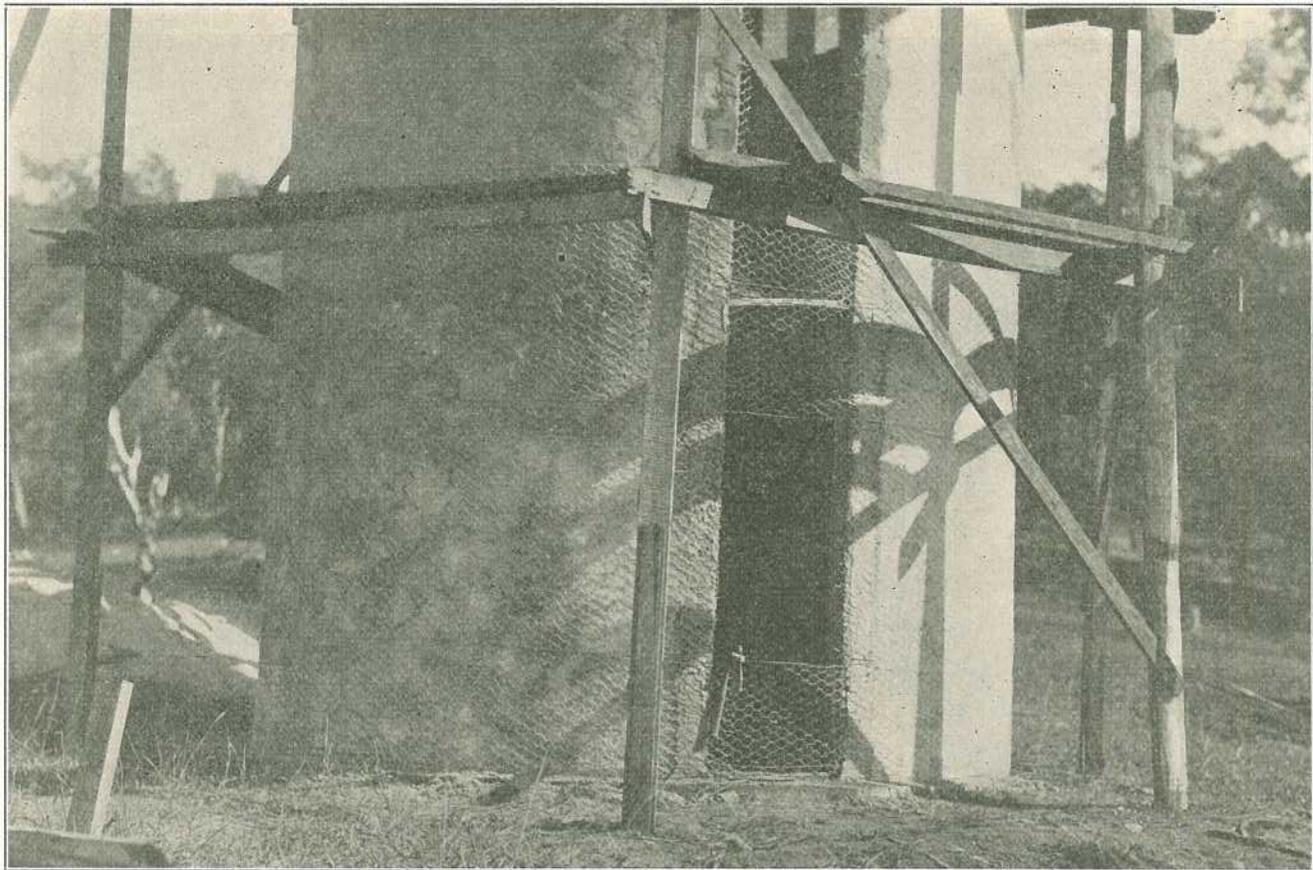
Close-up of reinforcement being applied; part of which has received a coating of compo.
